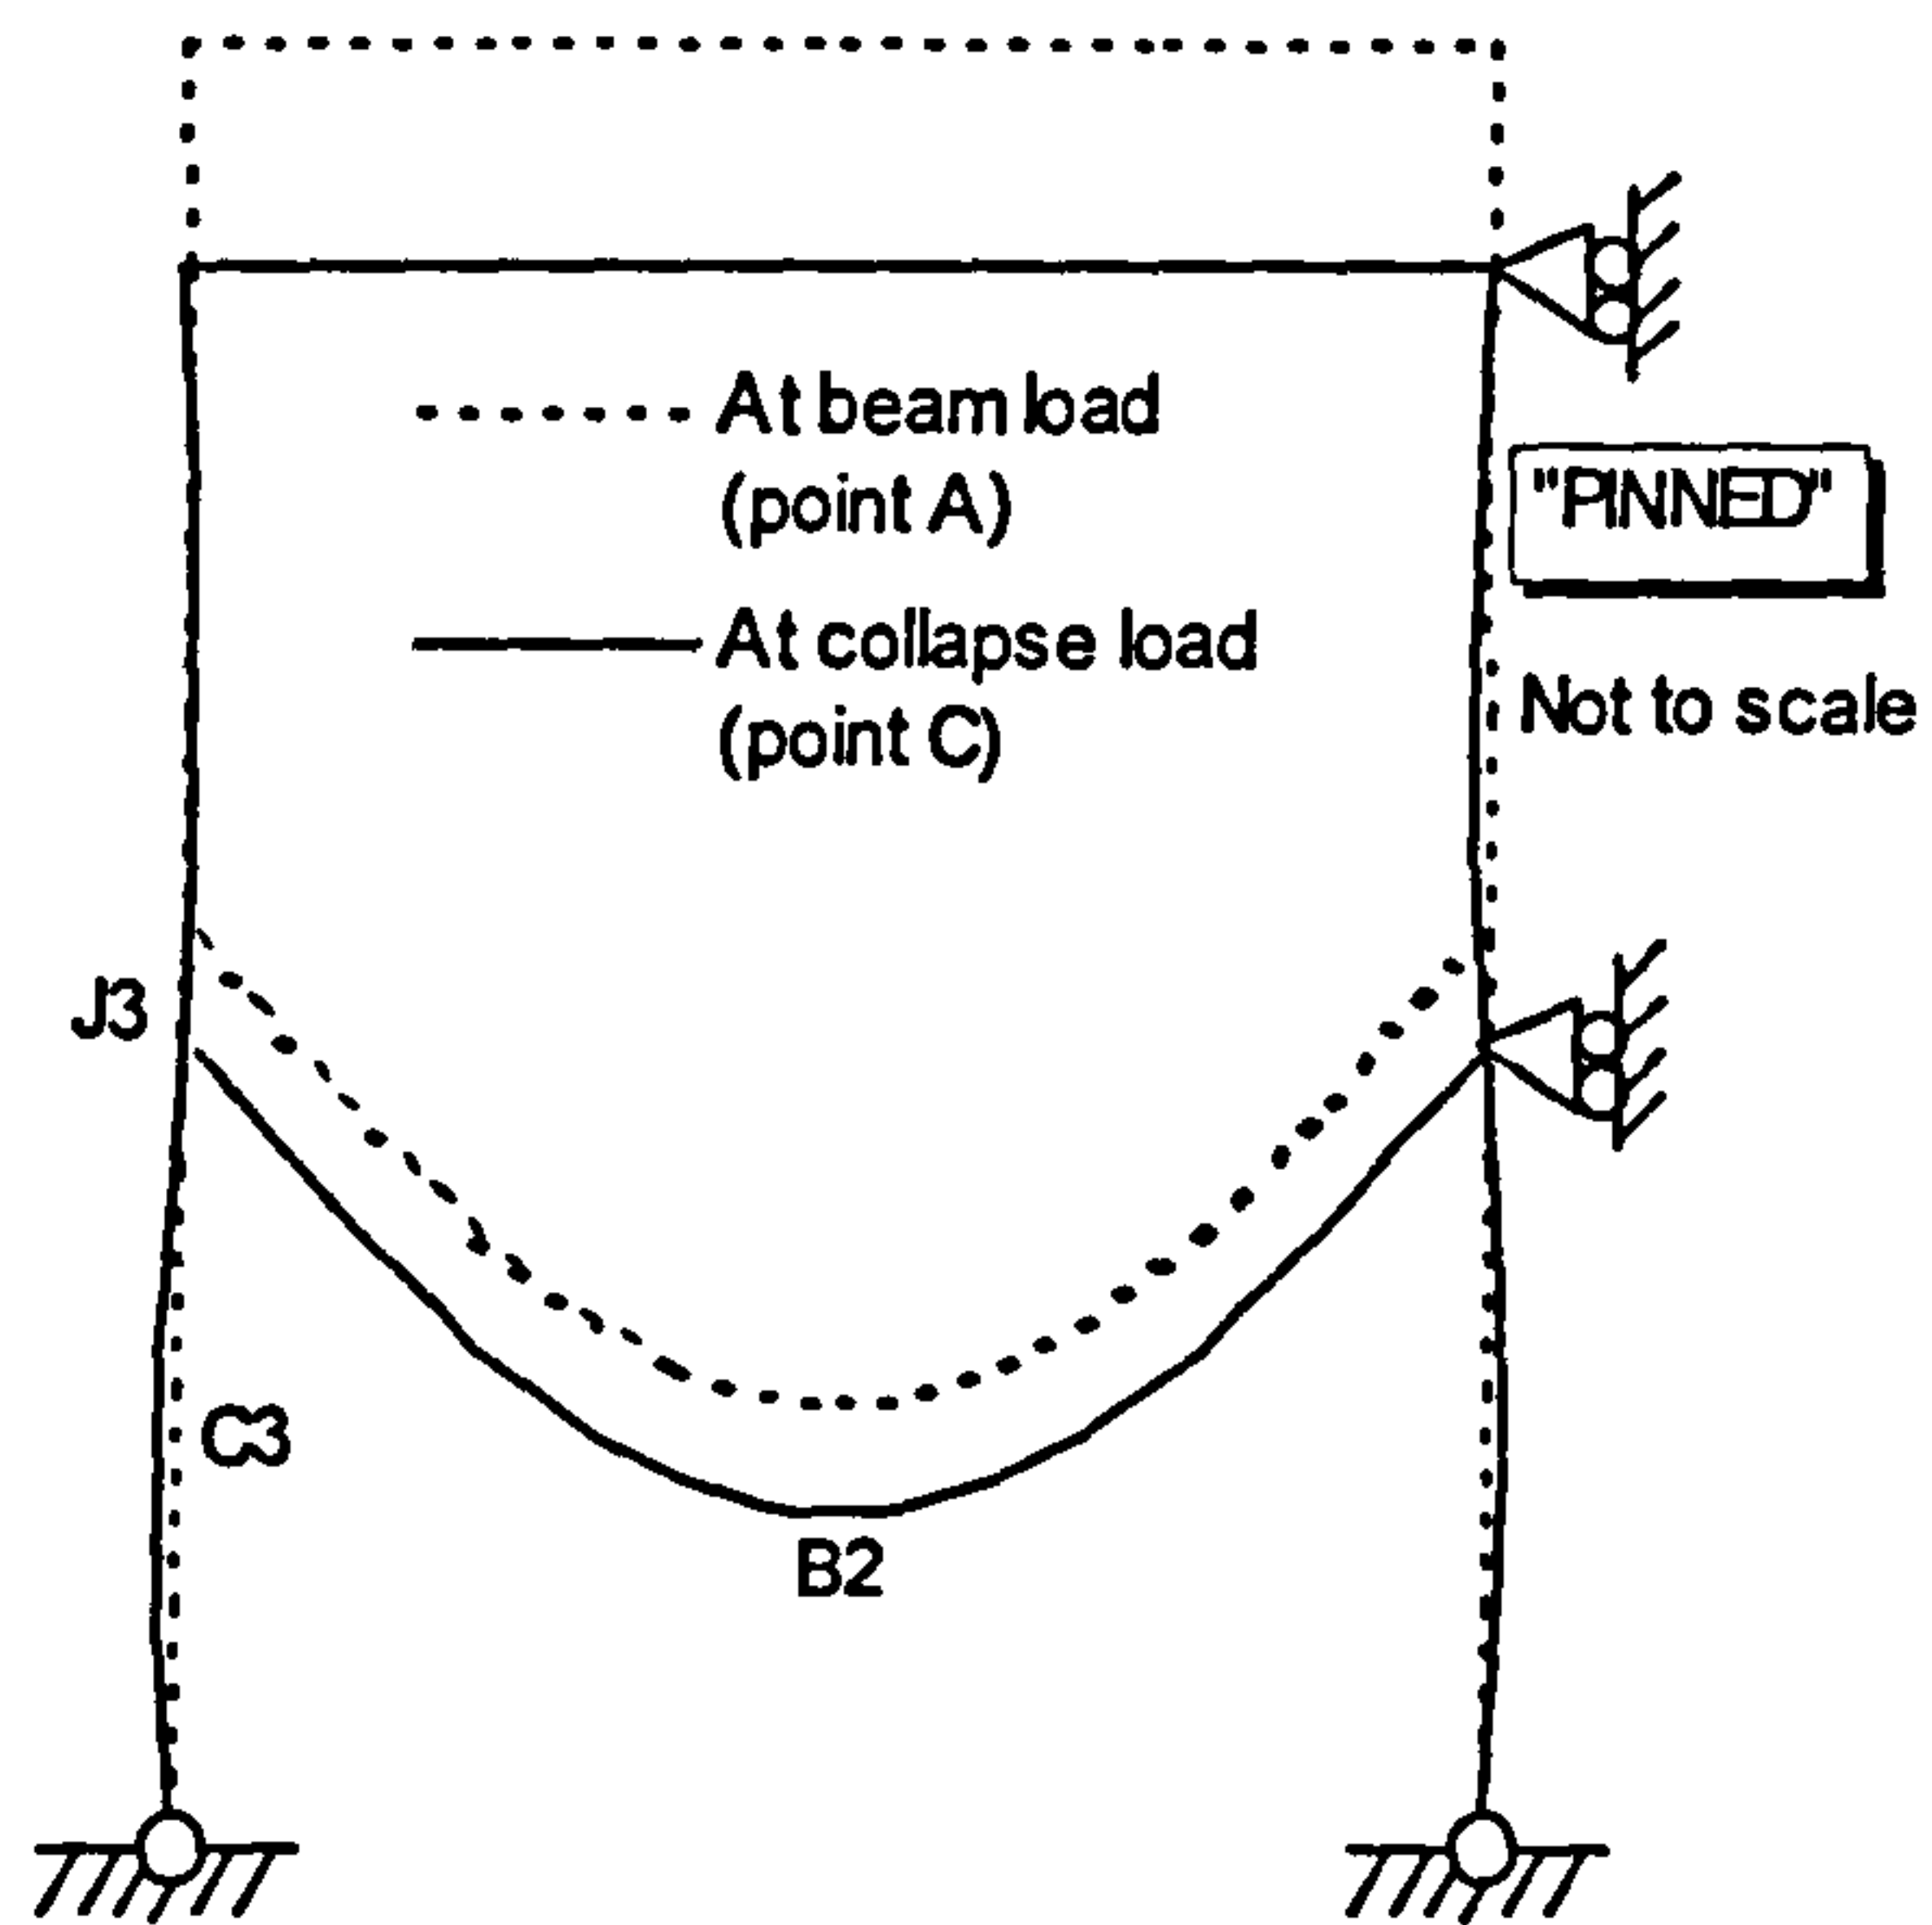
Exaggerated deformed shape of frame with "PINNED" connections
